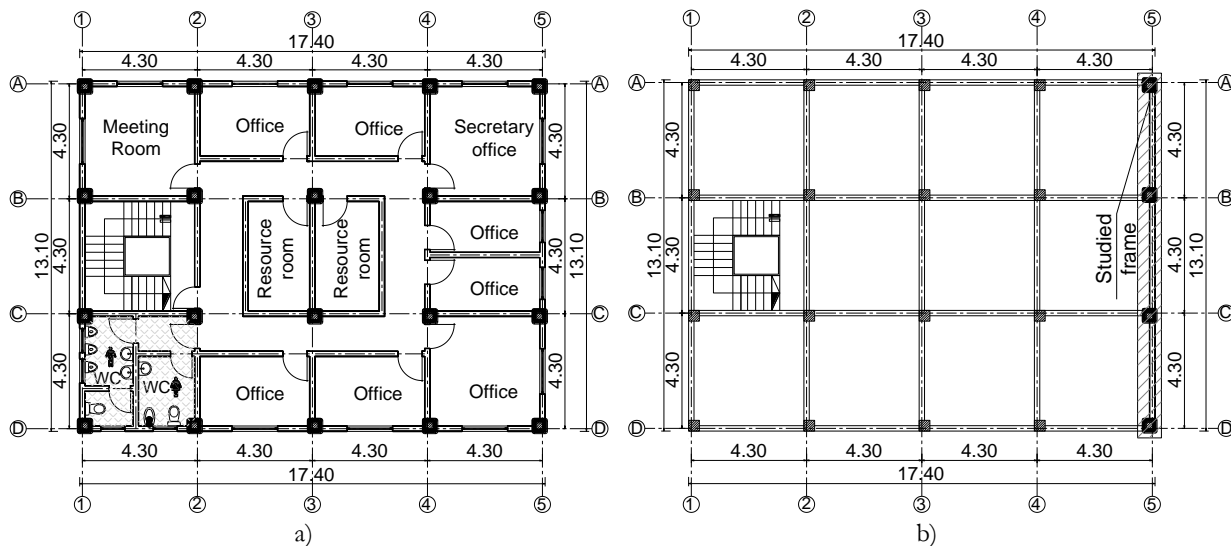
Typical plan view for the considered office building: a) architectural plan b) structural system showing the considered frame (all dimensions in m)
